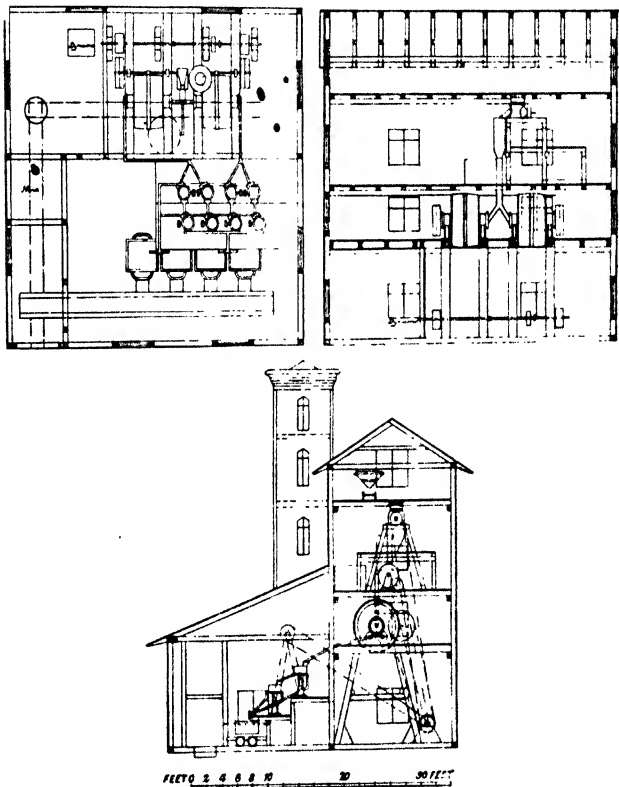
Scandinavian wet magnetic separator plant. Sectional elevation.
